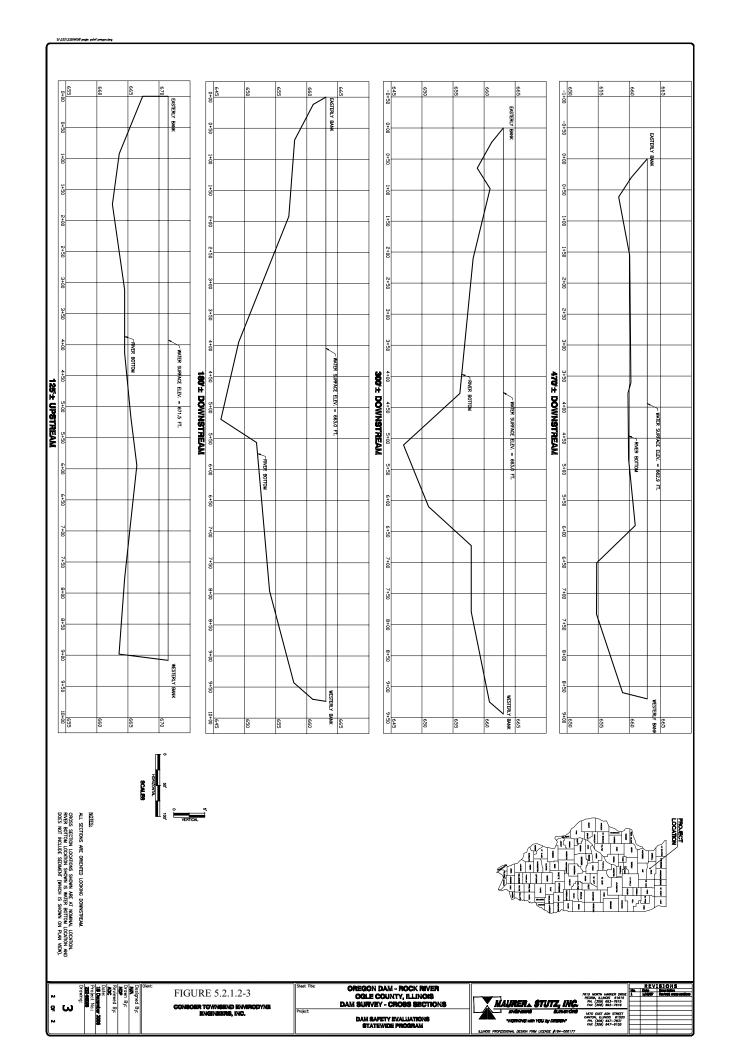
3 – Oregon Dam, Rock River
